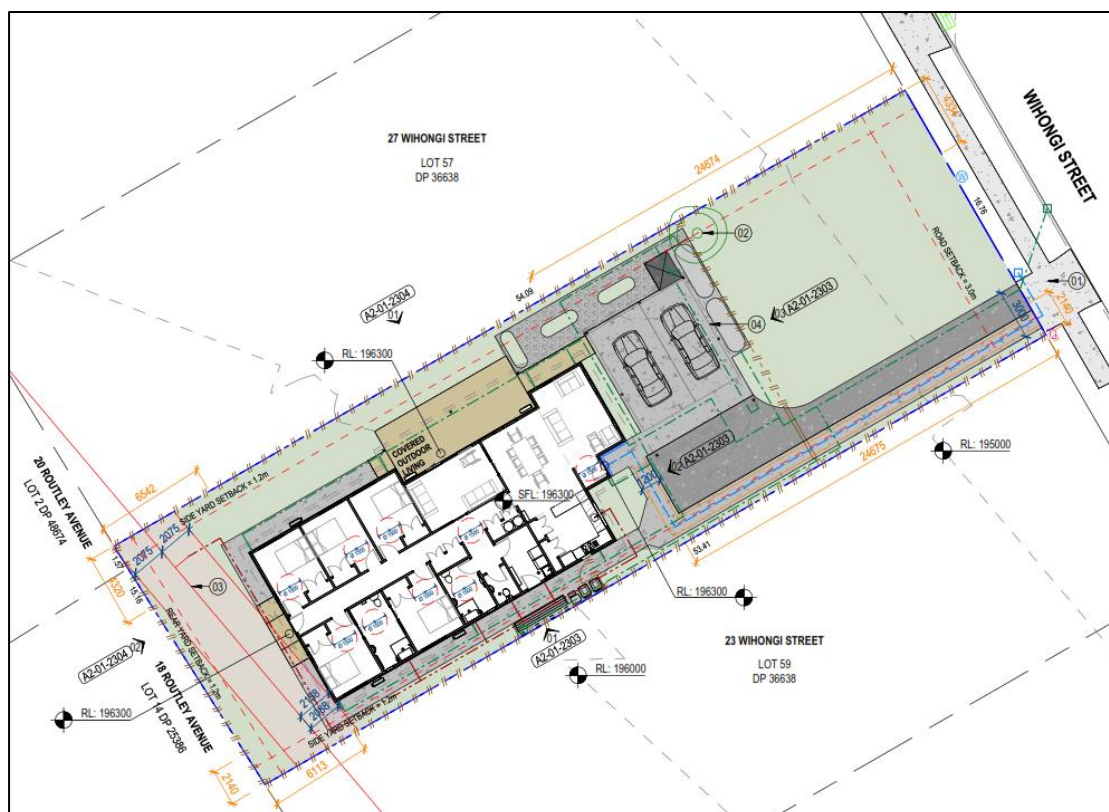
Site plan. Source: Appendix 2: Architectural Drawings.
